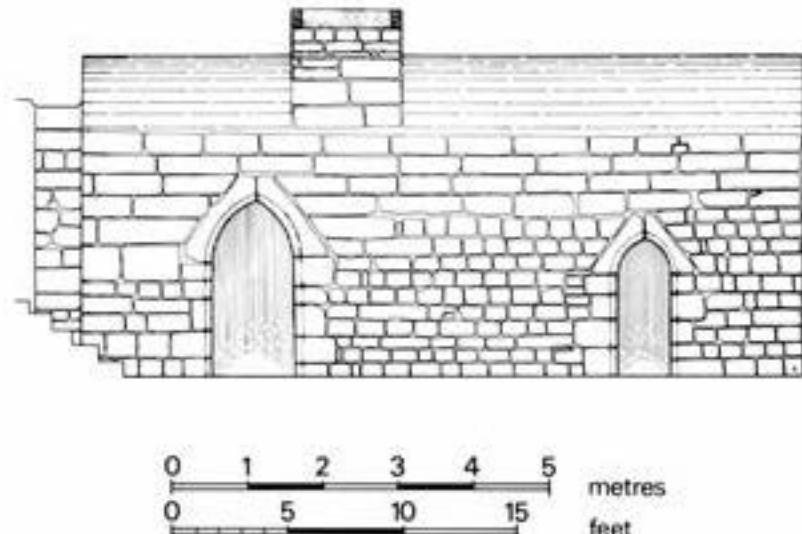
The keep; internal east-west elevation of the south wall of the ground floor passage (room 4)
